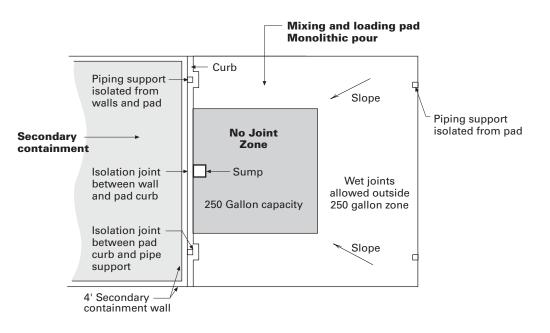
Common Joints in mixing and loading pad (side sump design). Note location of piping support outside secondary containment structure.
